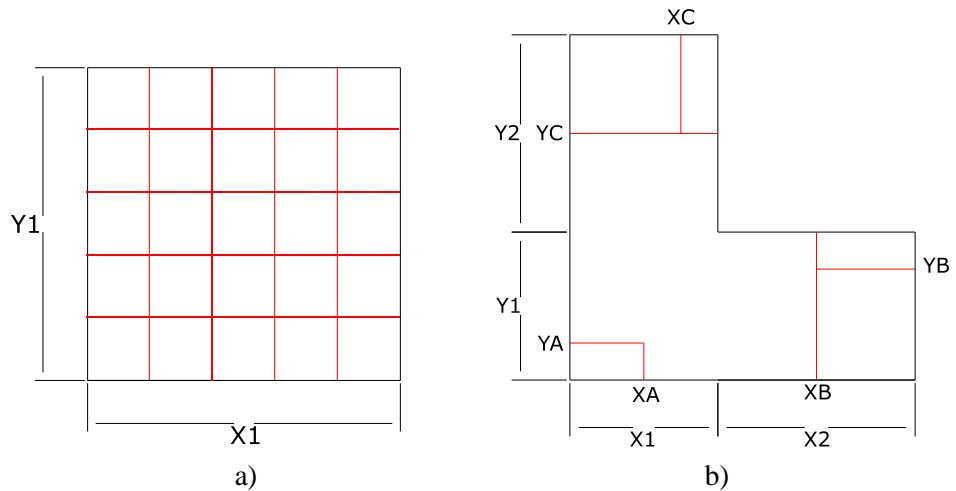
Floor beams for a) Rectangular and b) L-shaped structures
